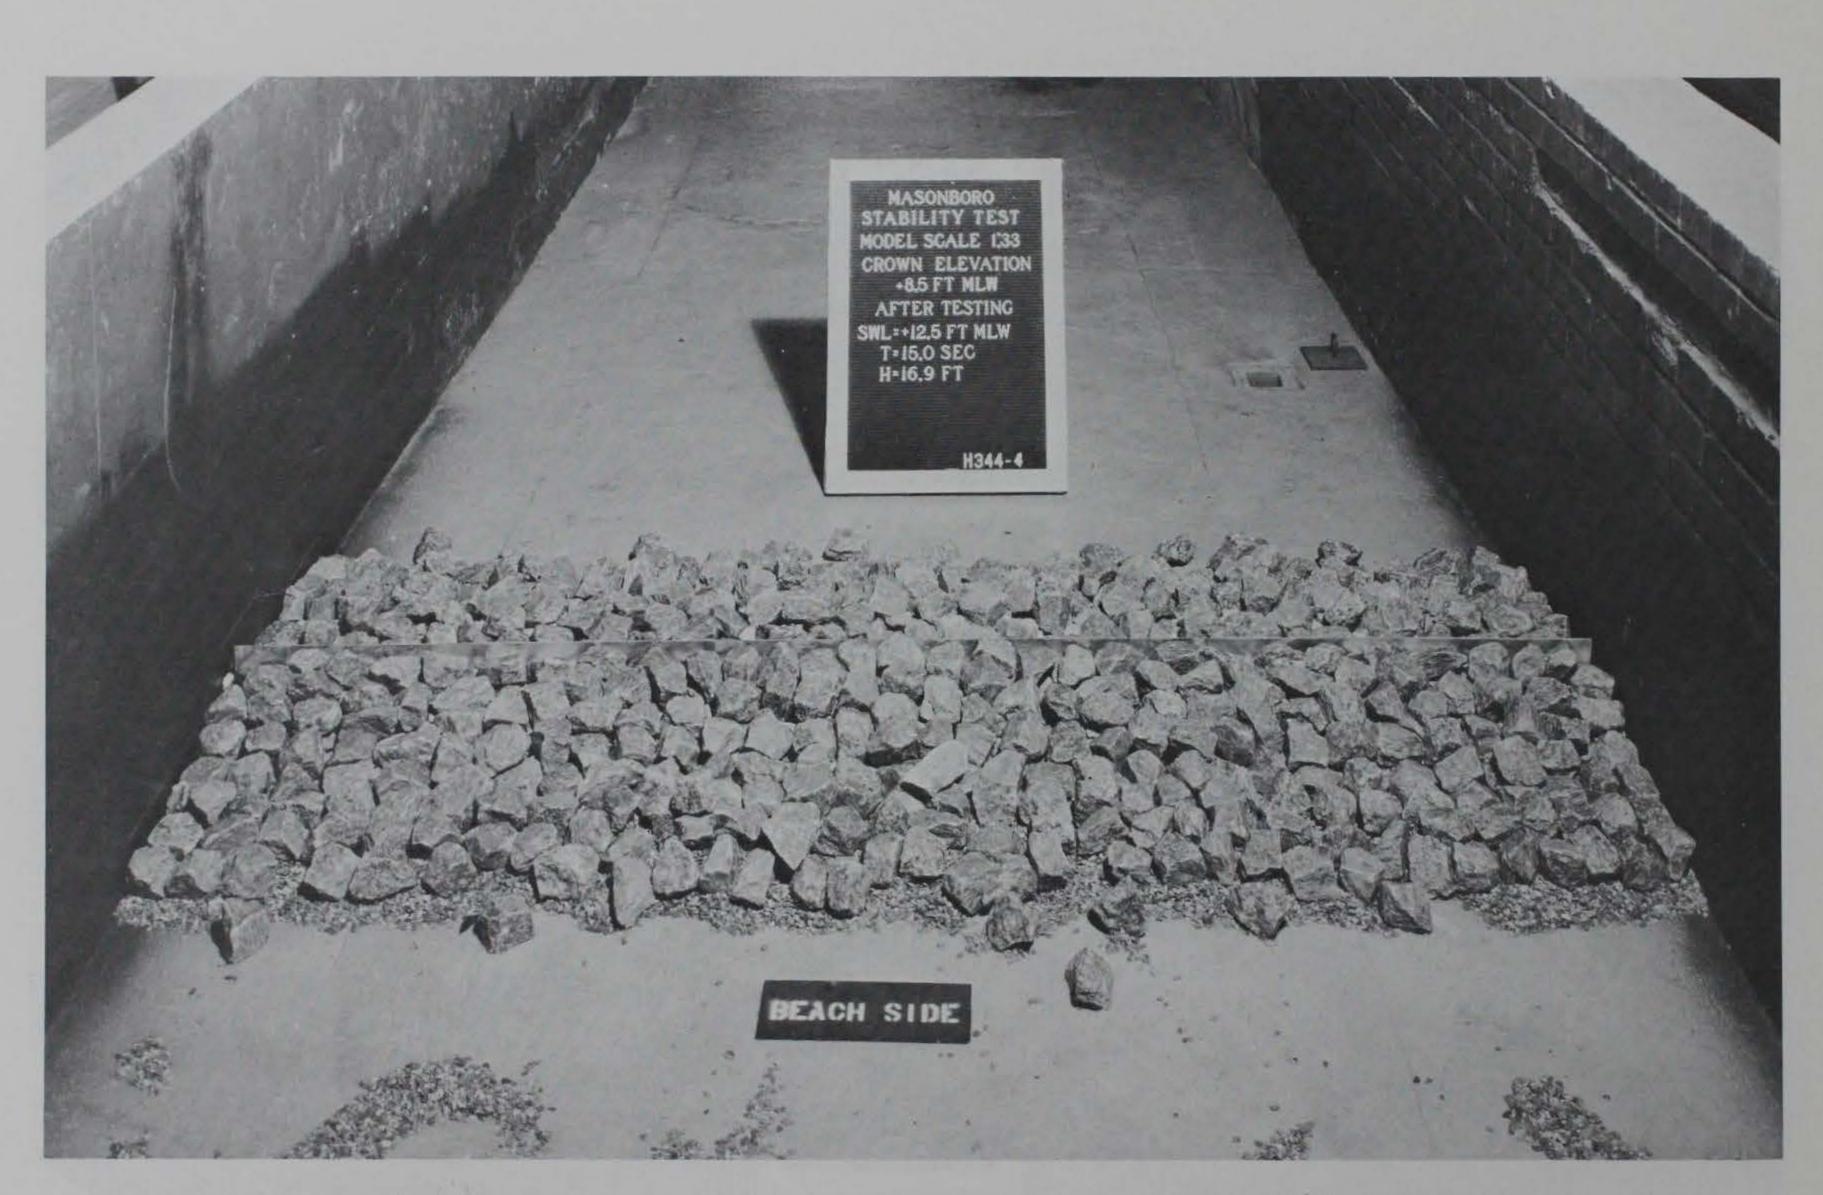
Beach-side view of Plan 1 after attack of 15-sec, 16.9-ft waves at an swl of +12.5 ft mlw for 4 prototype hr
